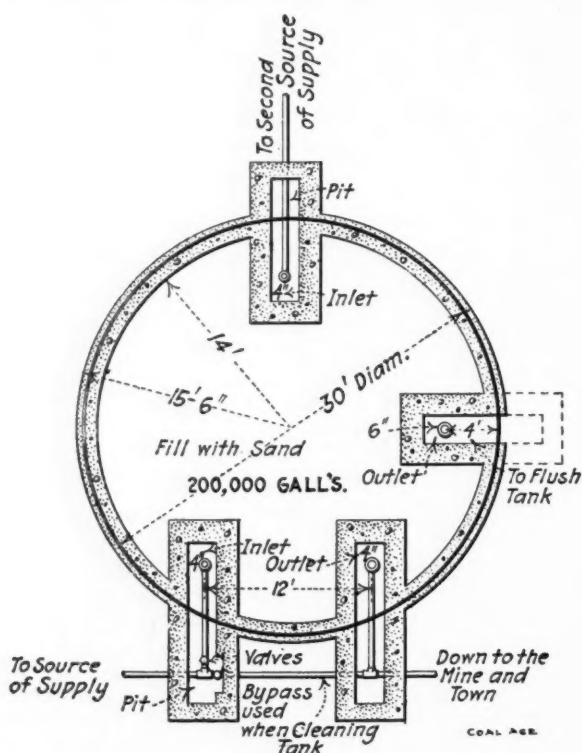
FOUNDATION AND ARRANGEMENT OF PIPES WHEN TWO TANKS ARE USED
